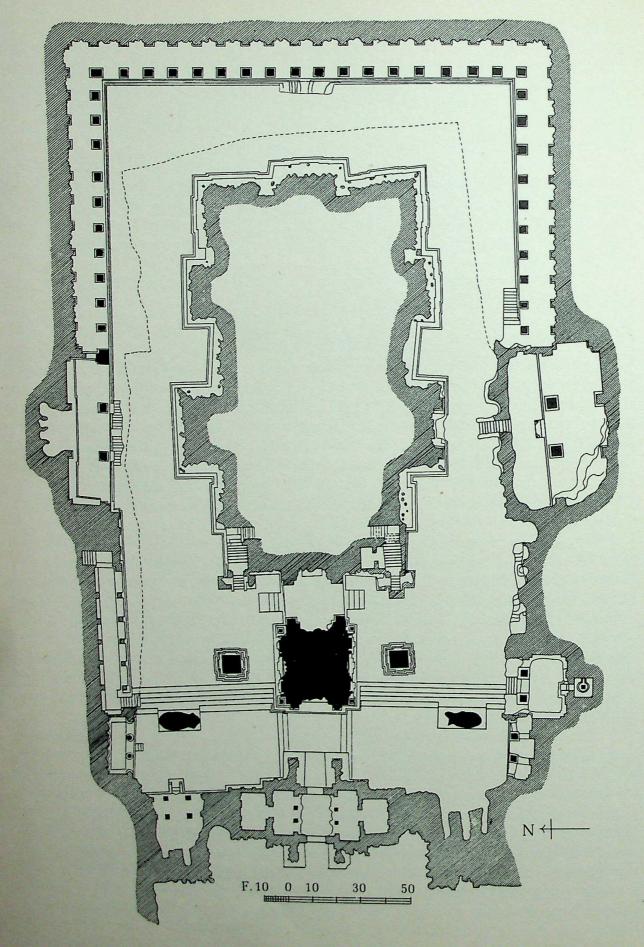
Ĕllōrā. Kailāsa temple, plan, lower section. (After Burgess.)
